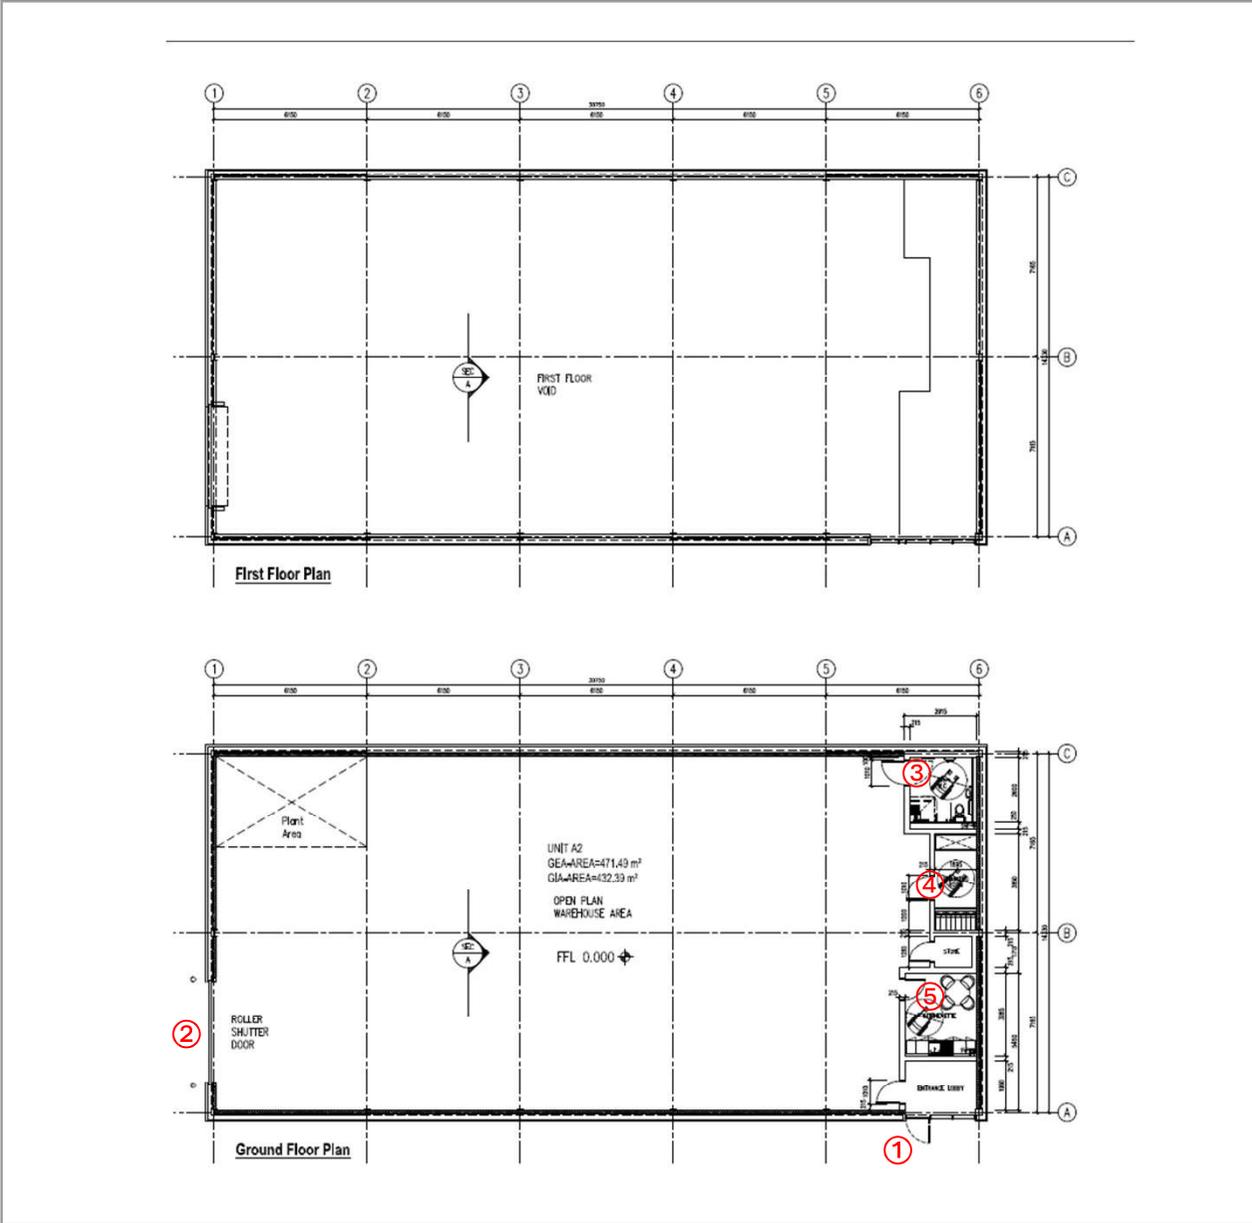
B Unit A2 Floor plans (extract from Drg. No. 122016 P101 - P03)
